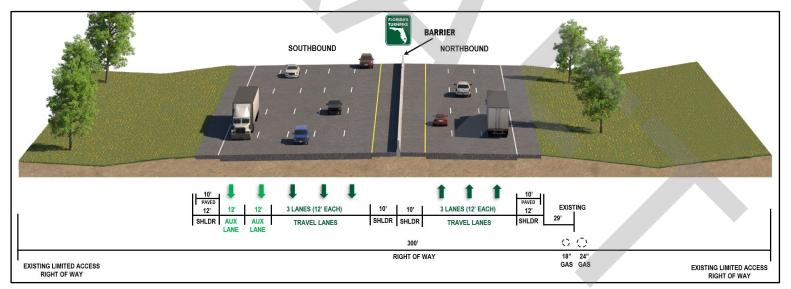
Florida's Turnpike Existing Roadway Section between Sawgrass Expressway and the County Line
